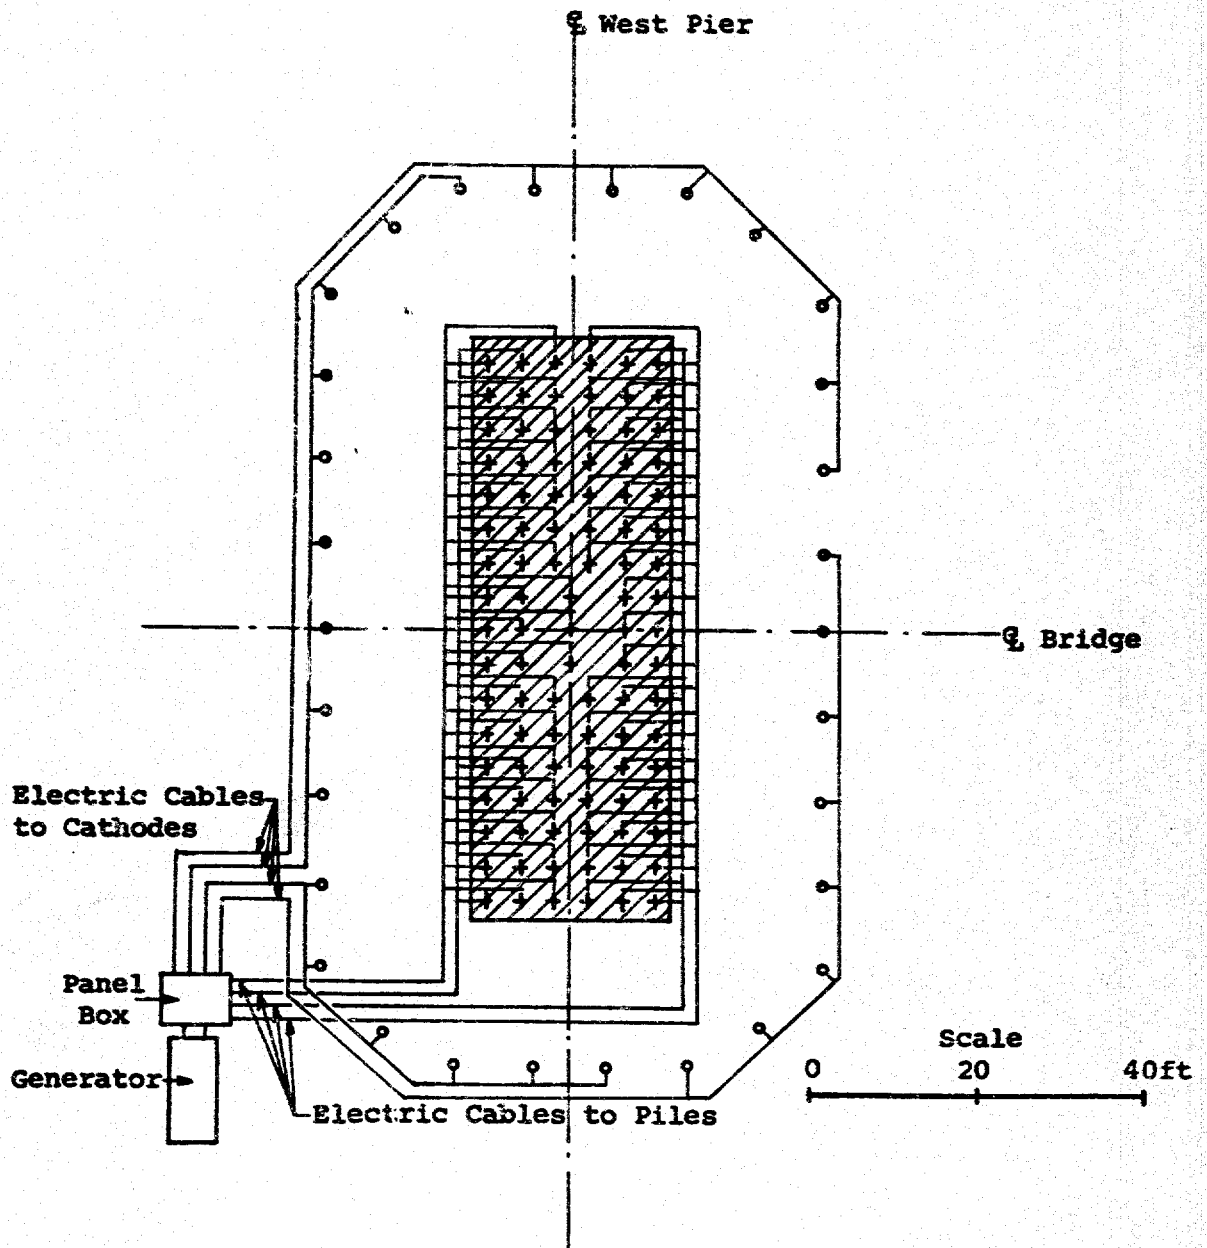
ELECTRICAL INSTALLATION AT WEST PIER OF BIG PIC RIVER BRIDGE,
